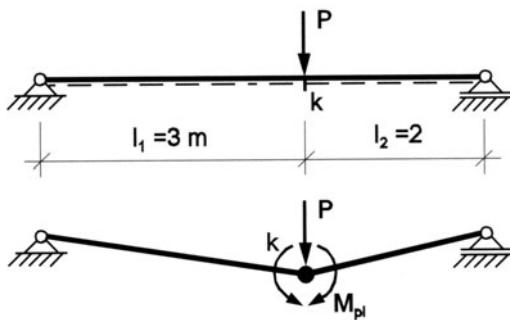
Steel girder; statical system with loading; governing failure mechanism
